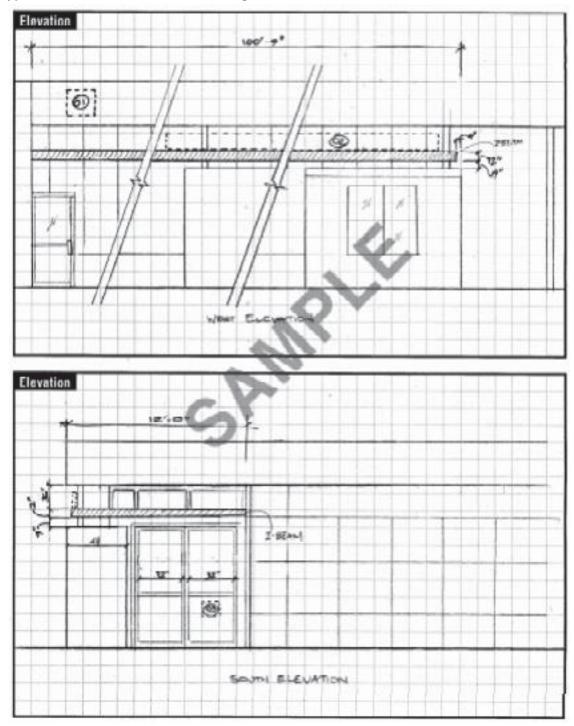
Typical Exterior Elevation-Freestanding Post Office
